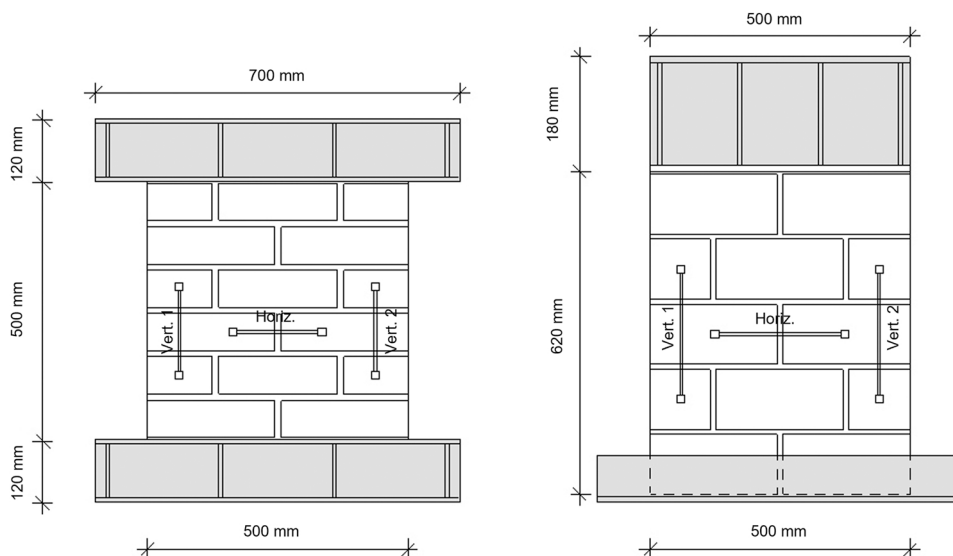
Test set-up of the masonry wallets including measuring sections of NF (left) and 3DF (right) specimens.
